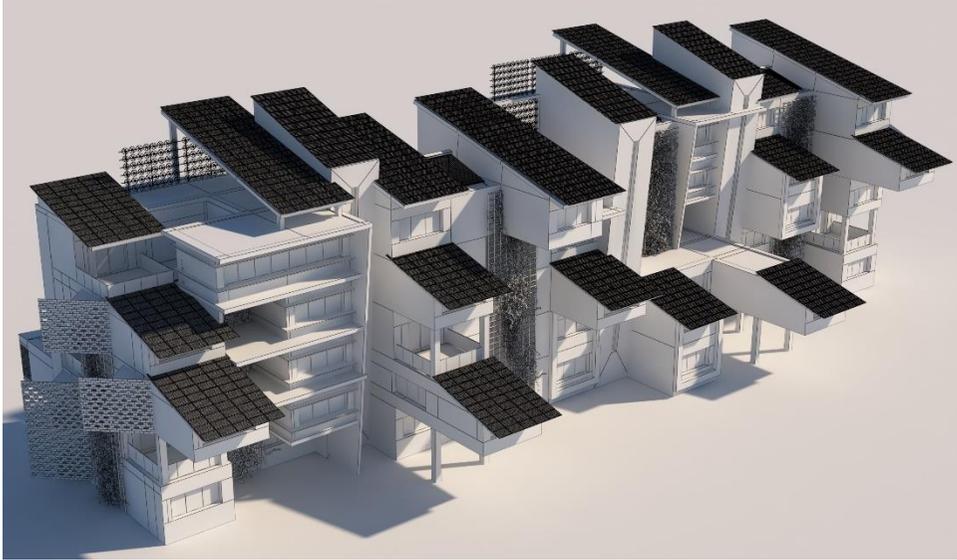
PV panels that covered roof incline surface and south façade incline shadings, Source: Author.
